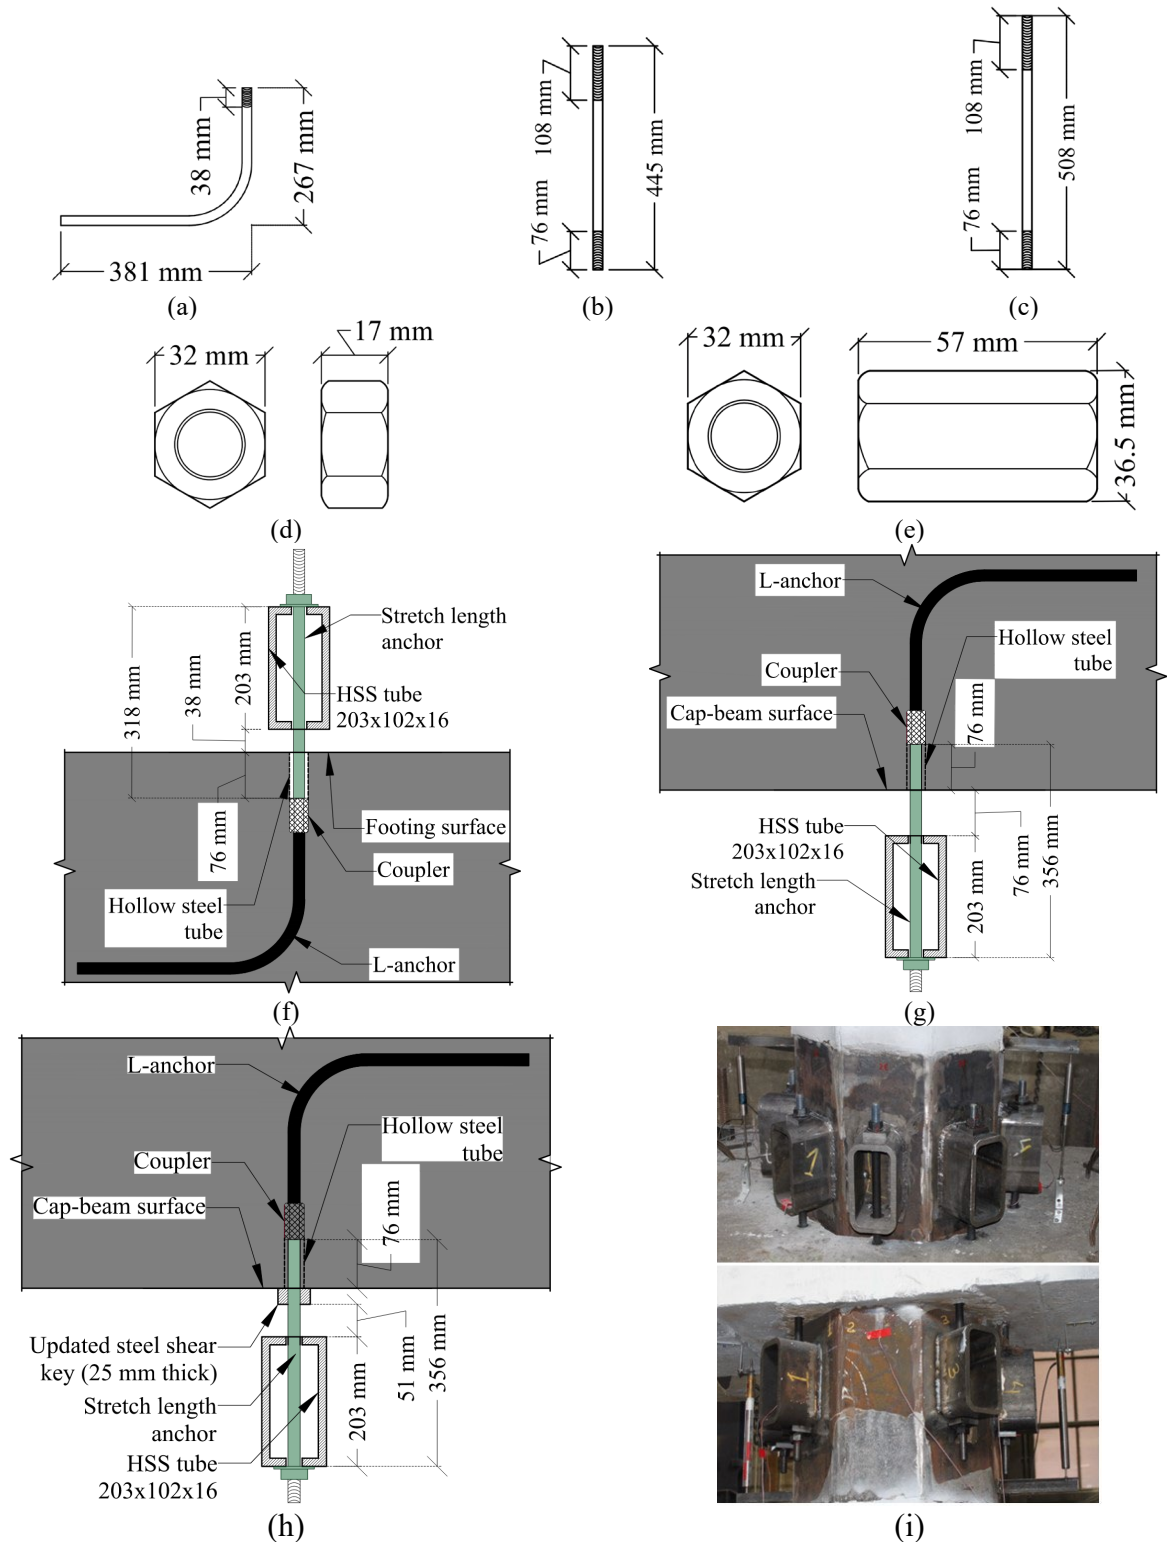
Stretch length anchor details: (a) L-shaped anchor; (b) SLA for footing; (c) SLA for cap beam; (d) hexagonal nut; (e) coupler; (f) connection at footing; (g) connection at cap beam 4F and 4FA; (h) installation at footing; and (i) connection at cap beam 4FB and 4FBA.
